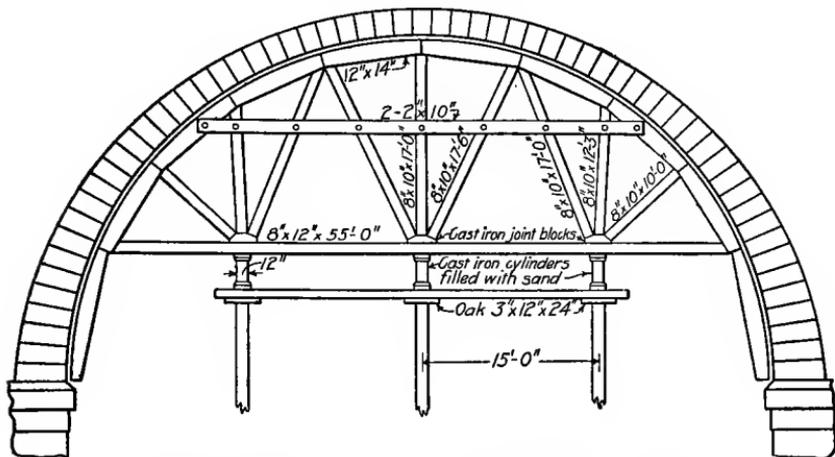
CENTER FOR ARCH IN WASHINGTON BRIDGE.
